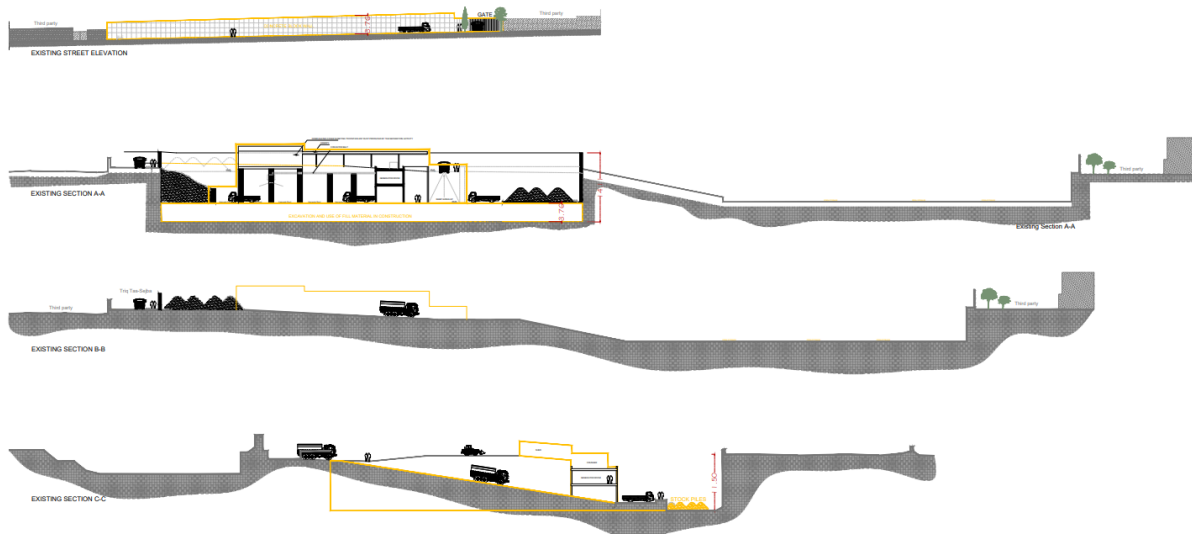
Existing sections and elevation (Source: EApps doc PA/08500/21 – 85g)
